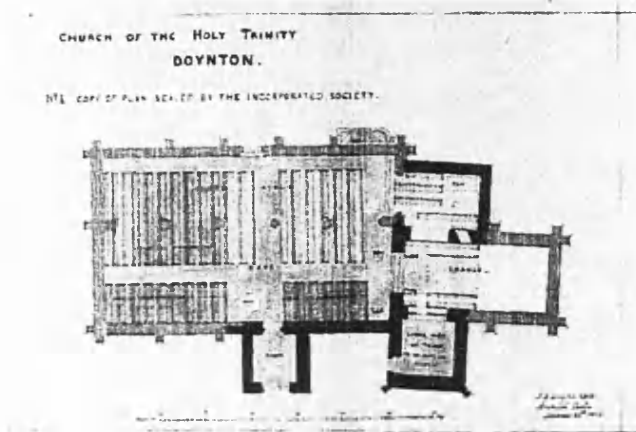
Holy Trinity, Doynton. J. Elkington Gill, ICBS Plan 06378. A dramatic example of Victorian 'enlargement'. Red walls are new; black retained from the medieval church. Virtually the entire nave and the chancel, are new.
